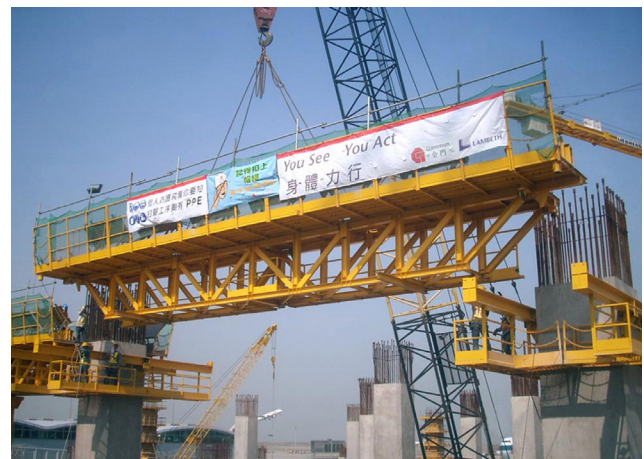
MECHANISED – Relocation of platforms: Integrated, safe access at column heads for platform installation
